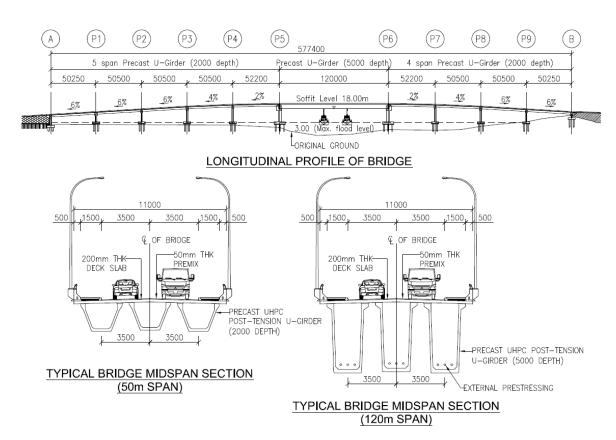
Longitudinal layout and typical cross-sections of proposed TKGG Bridge (dimensions in mm).
